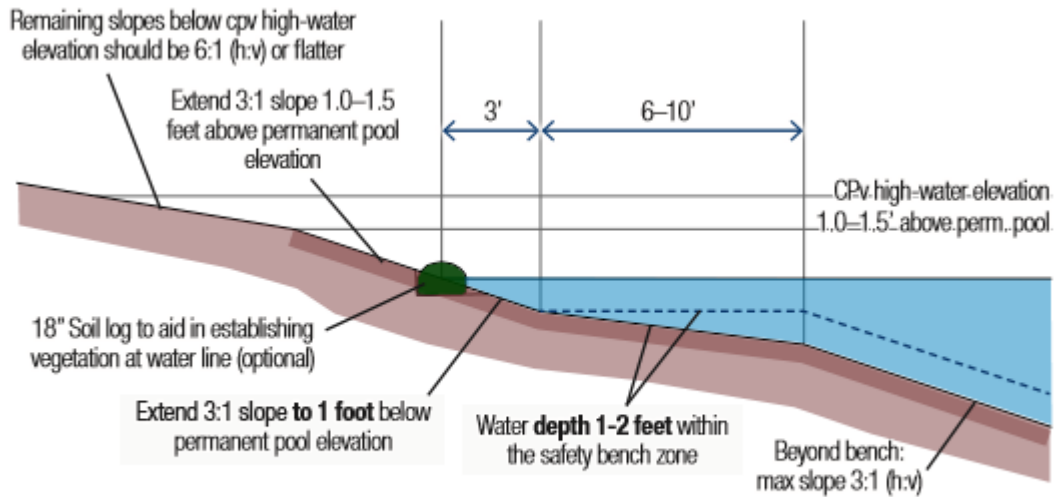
Wide Bench Cross Section, Iowa Storm Water Management Manual
